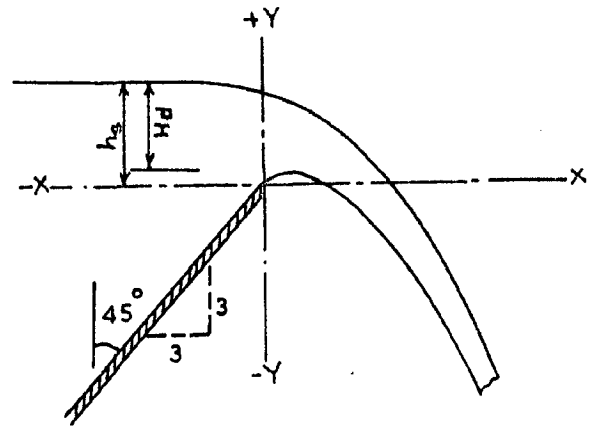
WEIR INCLINED DOWN STREAM ON 3:3 SLOPE
